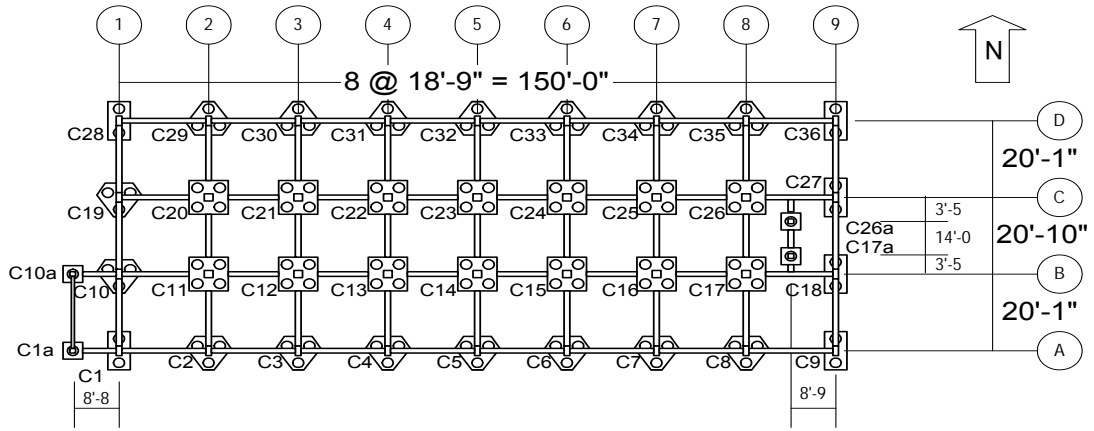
Hotel column plan (Ching et al. 2006c)
